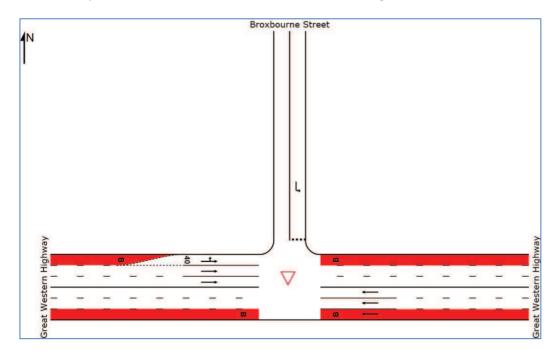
Great Western Highway / Broxbourne Street Intersection Layout
